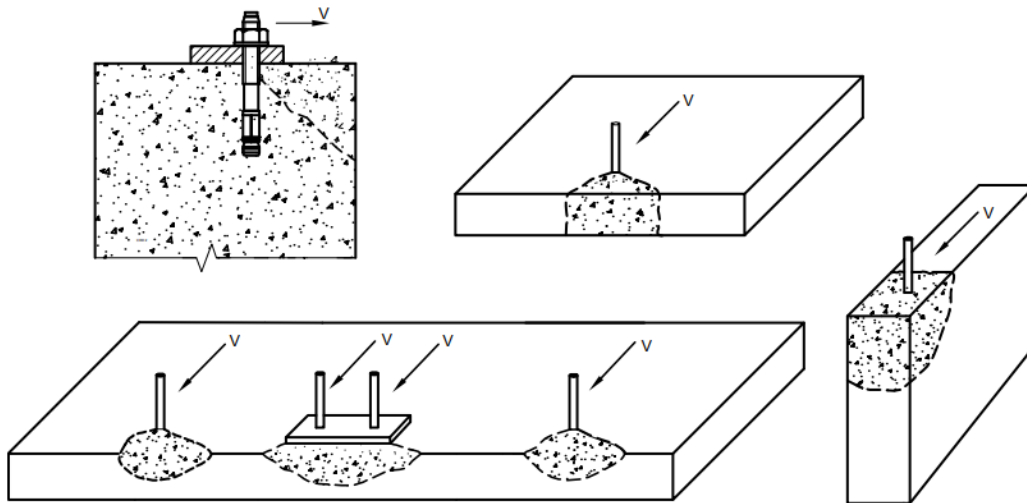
TYPICAL CONCRETE EDGE FAILURE
